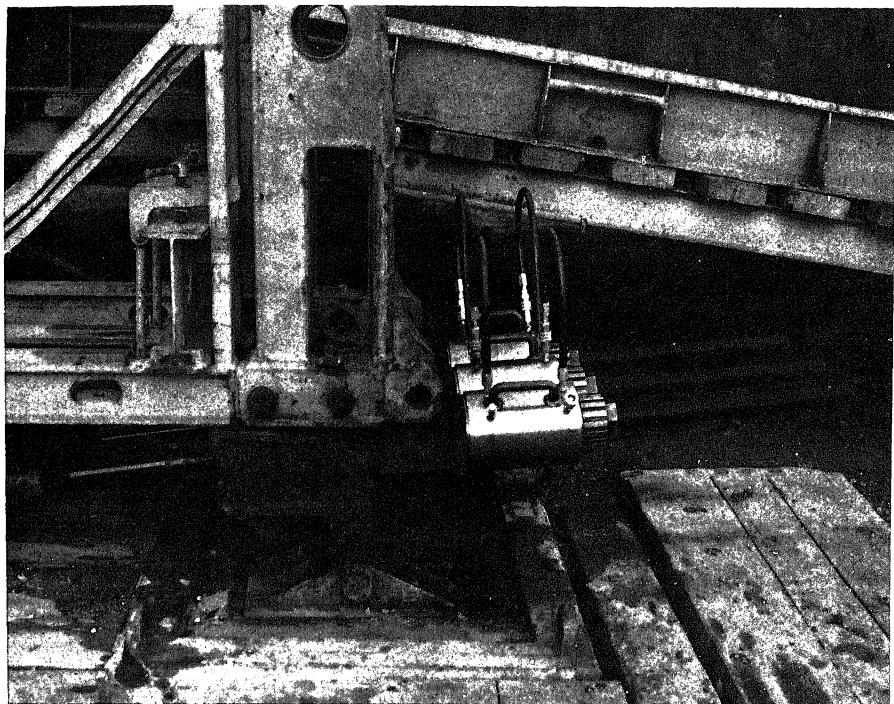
Double-acting hydraulic cylinders mounted on pull rods.
